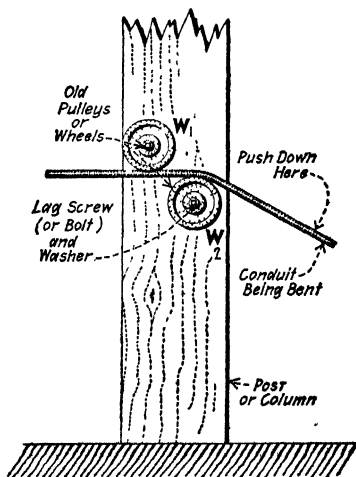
Bending rig comprising a couple of old wheels or pulleys bolted to a post.
